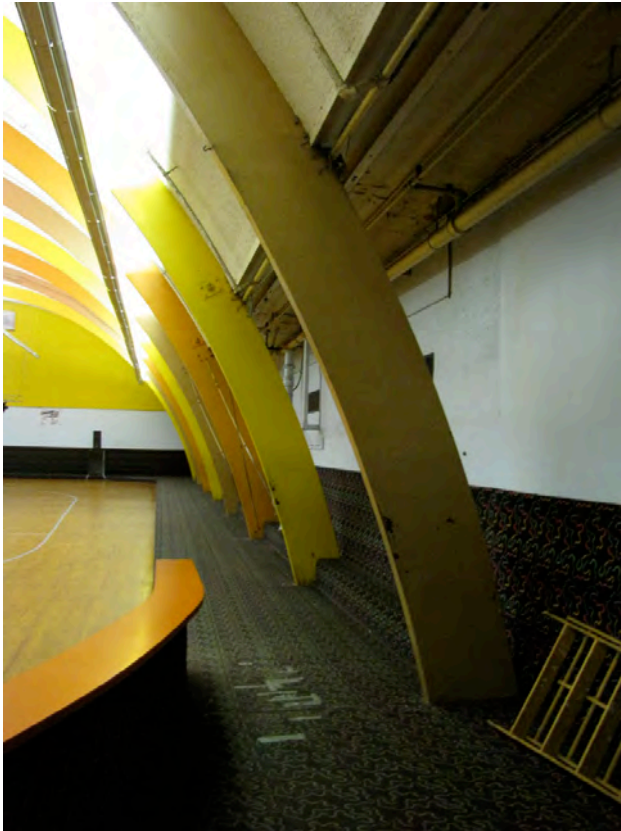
Detail of arched roof trusses. The arched trusses are made of layers of glue-laminated timber.
